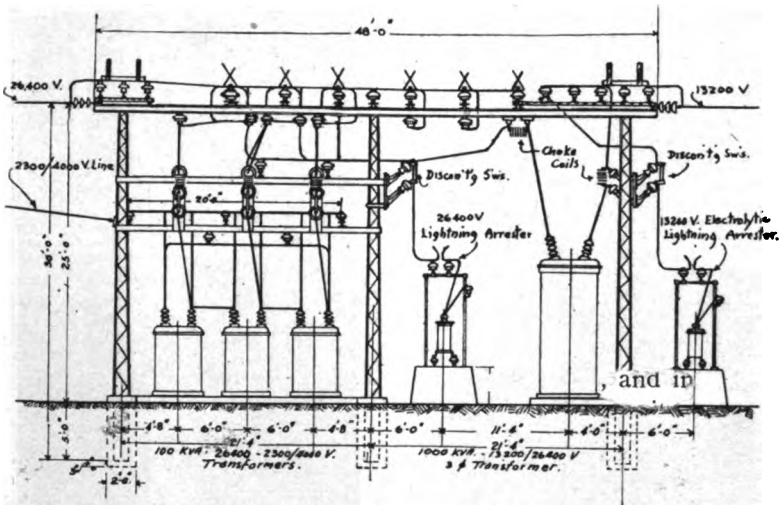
OUTDOOR SUBURBAN SUBSTATION
